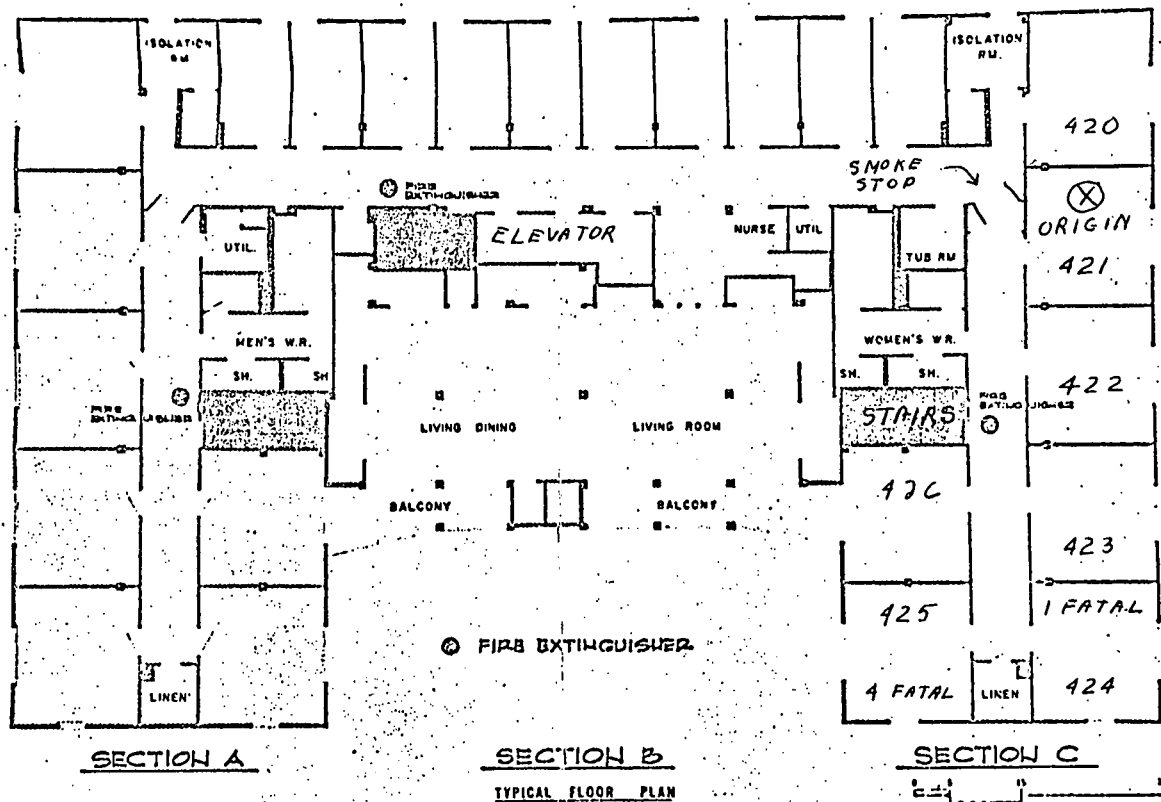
Fourth Floor Plan of Cermak House Nursing Home
